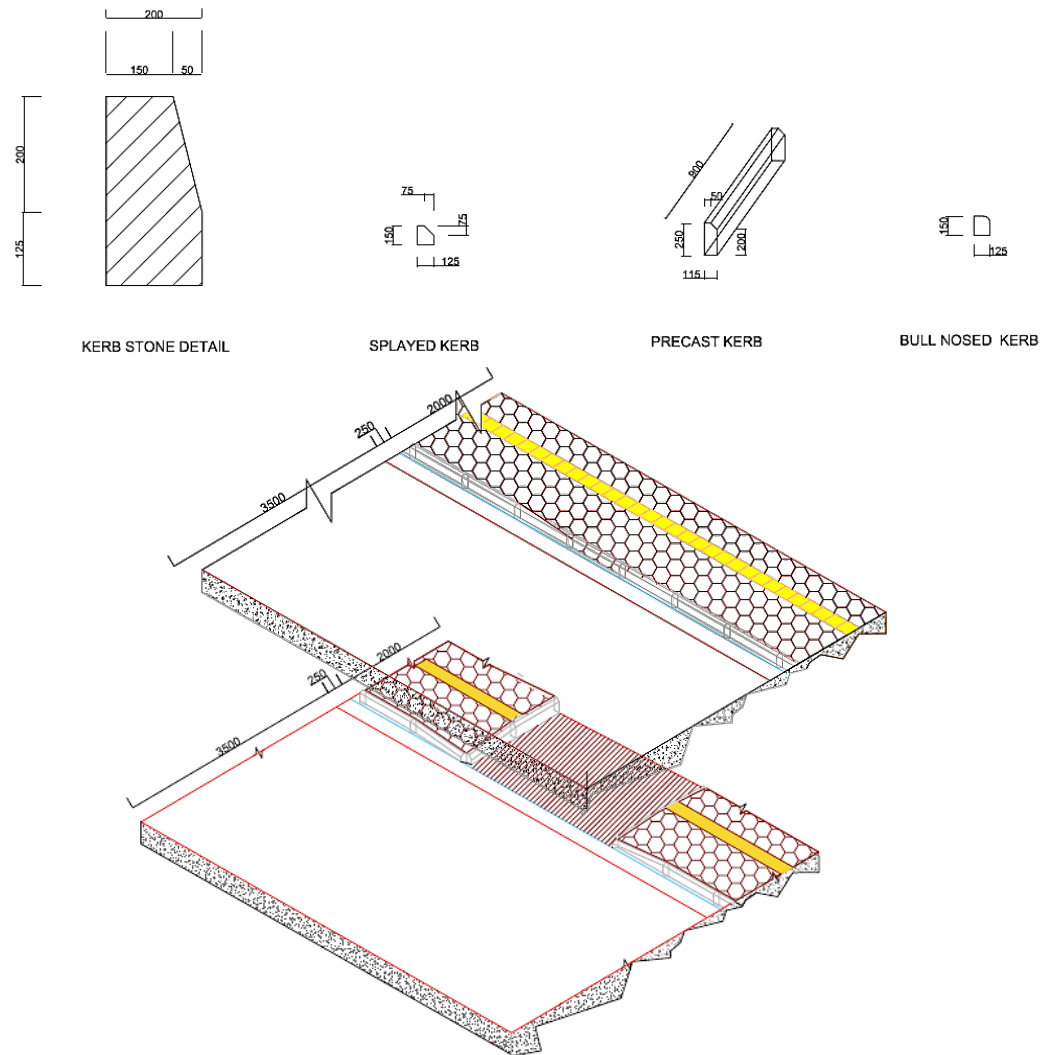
Typical Road Sections with Footpath, Drain and Retaining walls (10.5m)
